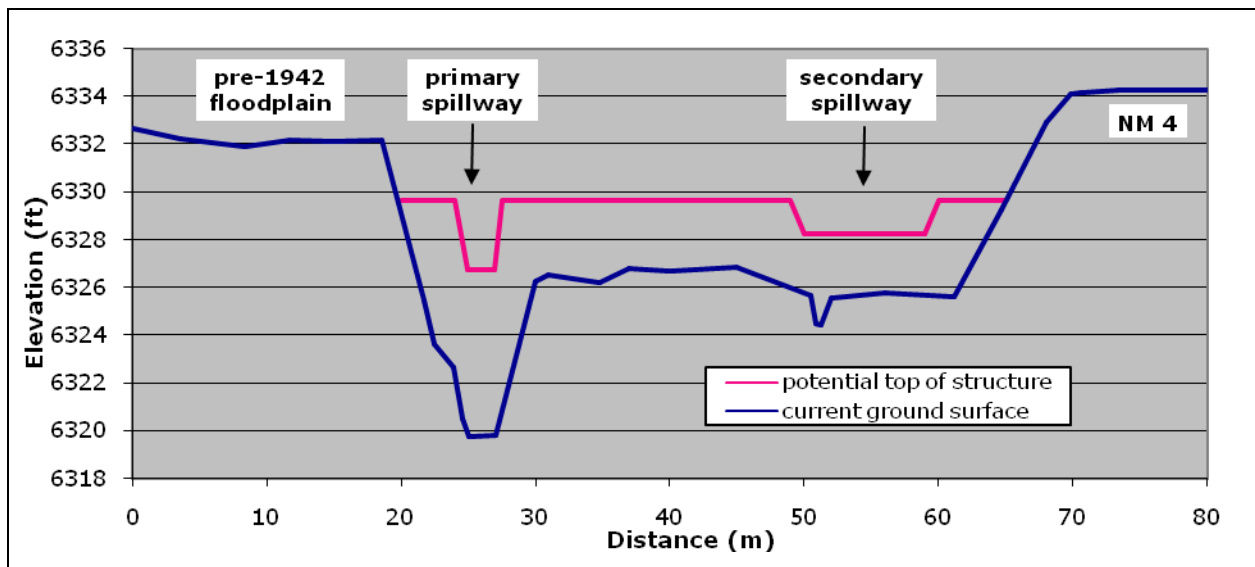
Cross-section profile of the proposed Pueblo Canyon grade-control structure
